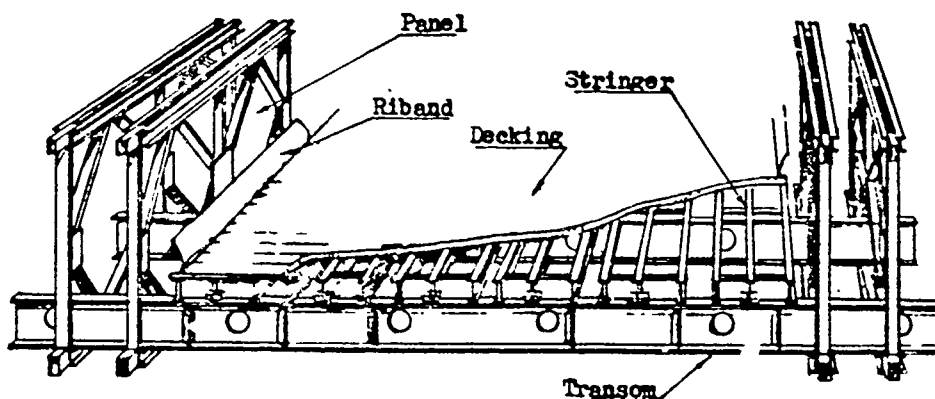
Double-Truss Single-Story Bailey Construction
